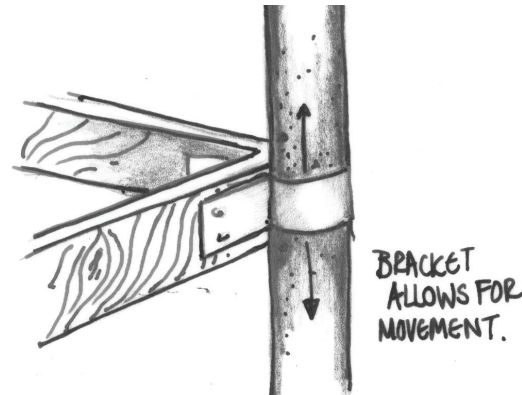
Example of a connection between the timber and concrete. Sketch by Author 2011
